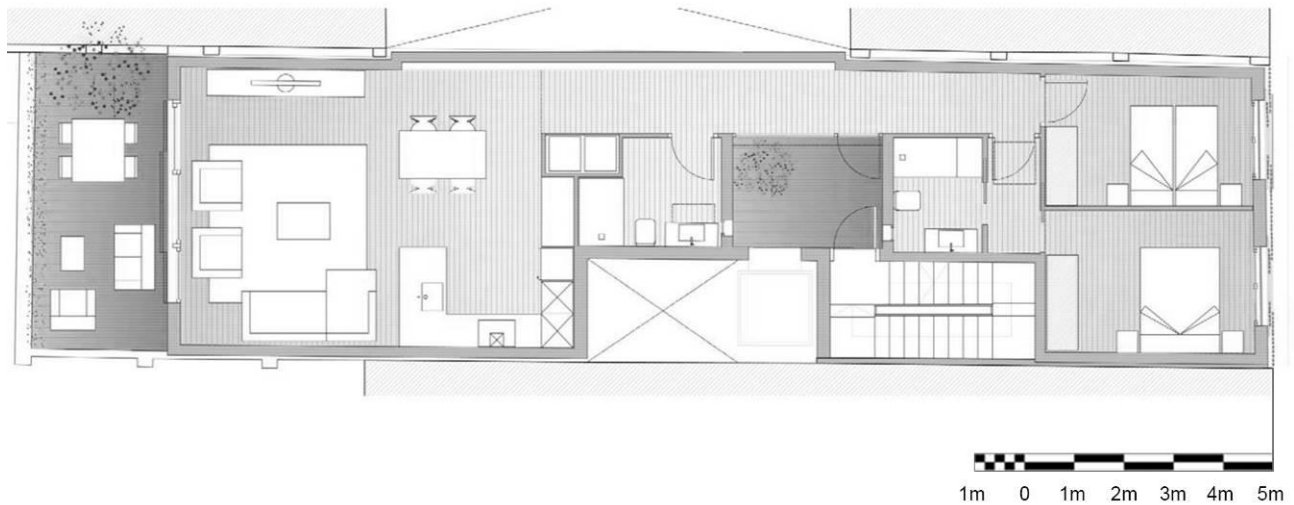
Floor plan Source: Casa Ático (Dossier Girona 81, 2015)
